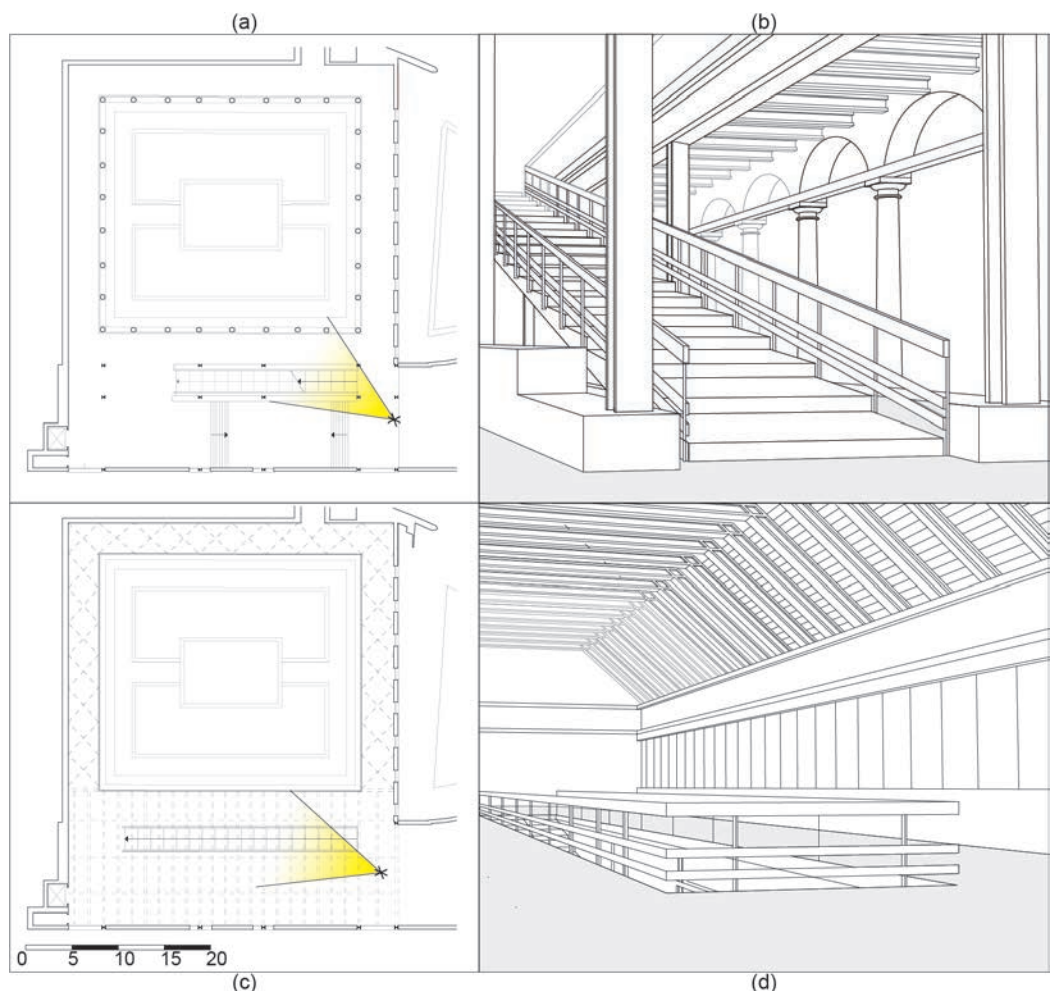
Sant'Agostino Museum, Genoa. (a) First floor plan. (b) View of the first floor where the arches delimiting the eighteenth-century cloister are highlighted. (c) Second floor plan. (d) View of the second floor highlighting the continuous series of windows.
